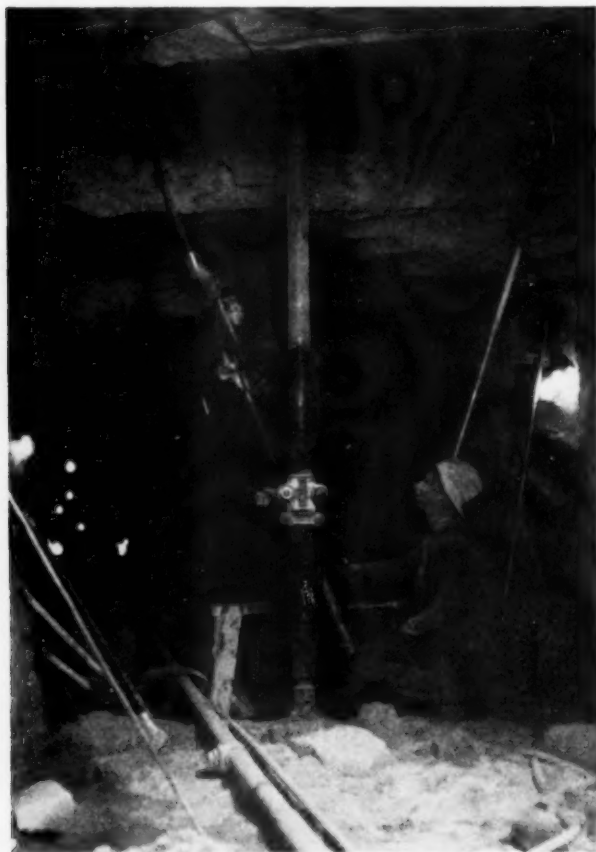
COLUMN USED IN RING DRILLING, AND STOPER DRILL BEING OPERATED IN THE CONSTRUCTION OF THE EAST RIM ROAD TUNNEL.
